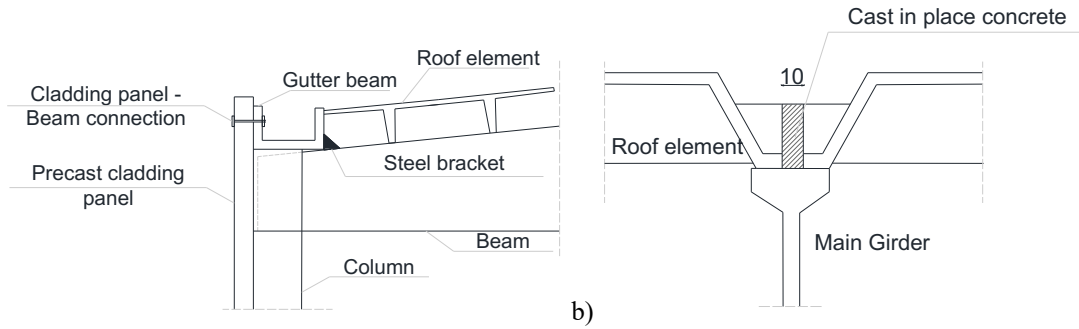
Structural scheme of the a) gutter beam to main girder connection and b) RC curbs in between the roof elements.
